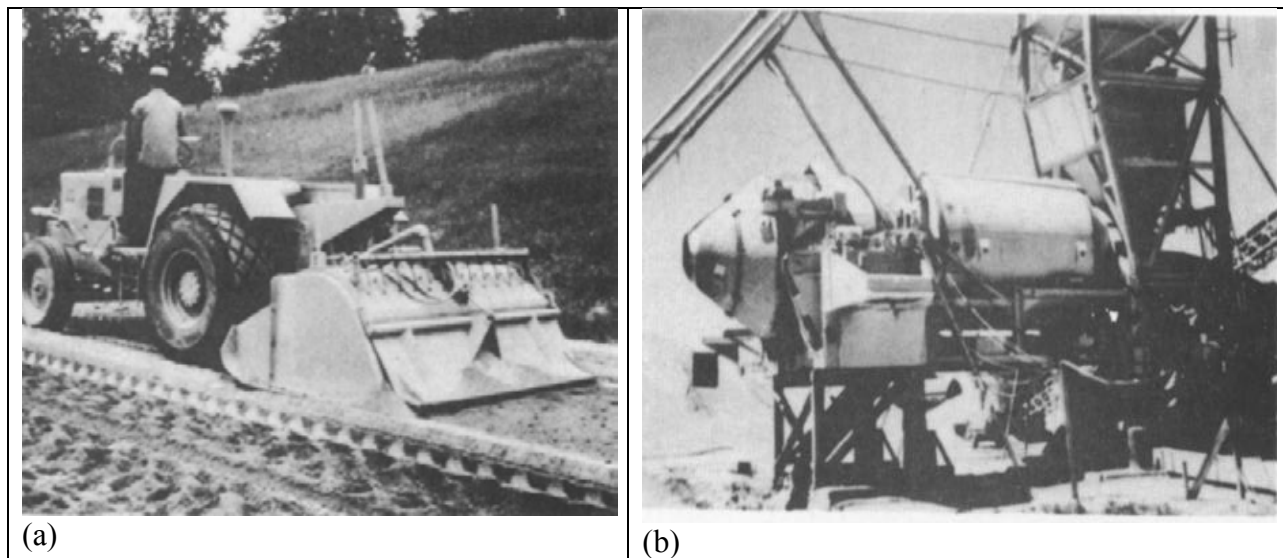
Methods for cement stabilization at construction site (a) direct mixing (b) mix plant (Photos courtesy of US Army Technical Manual [13]).
